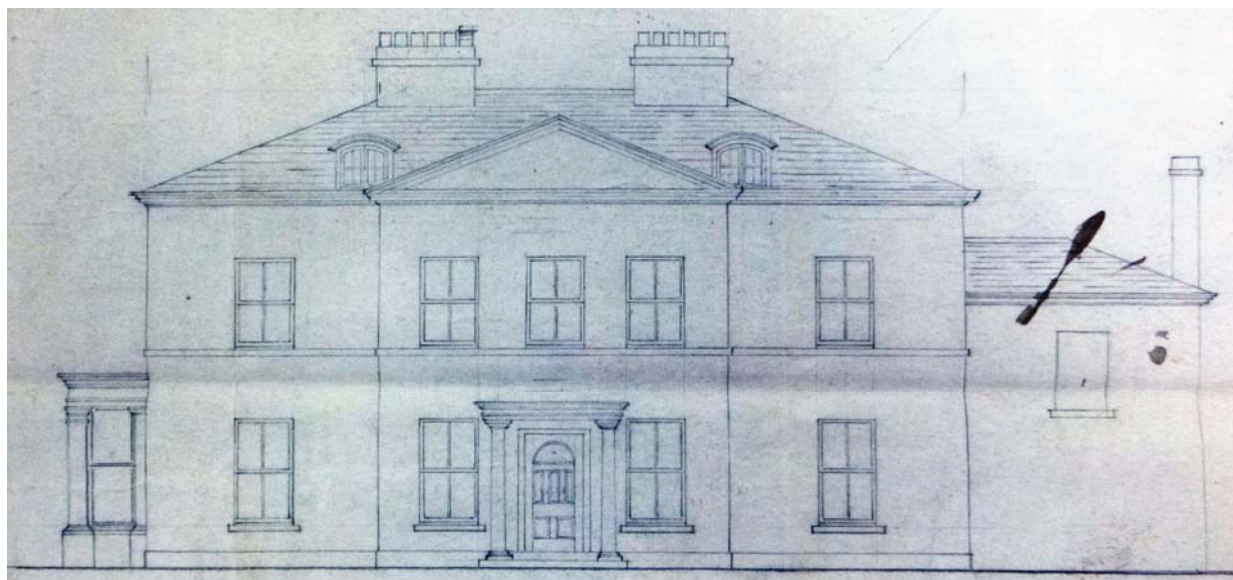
The north elevation of Fair View – marked 'north elevation No 1', either 'as existing' or one of two proposed alterations, 1889
